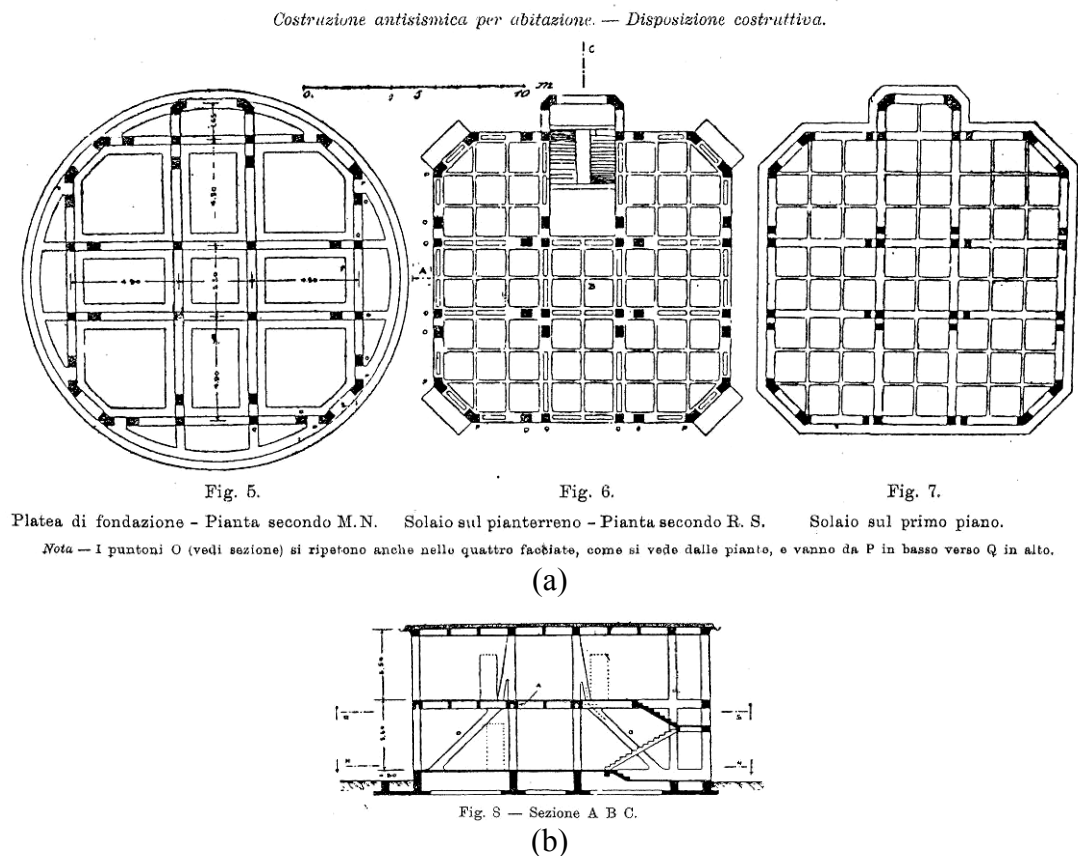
Danusso's earthquake-resistant building, a reinforced concrete frame: (a) Plans at foundation, at first and second level (from Danusso, 1910b); (b) Section
